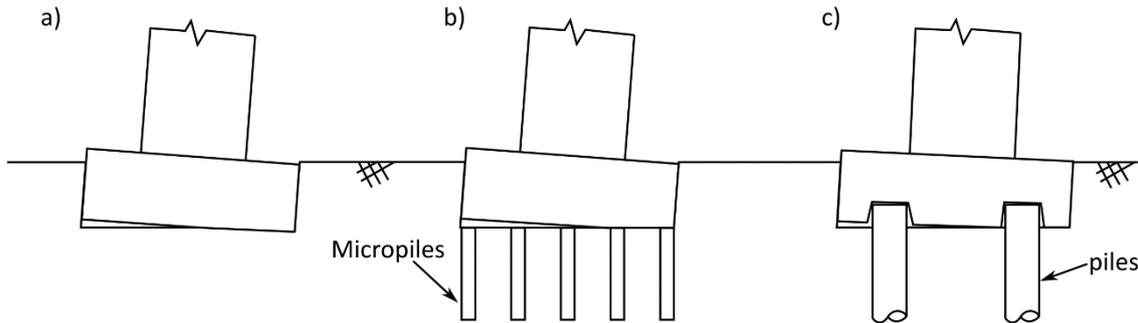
a) and b) examples of rocking shallow foundations, c) example of a rocking pile cap foundation.
